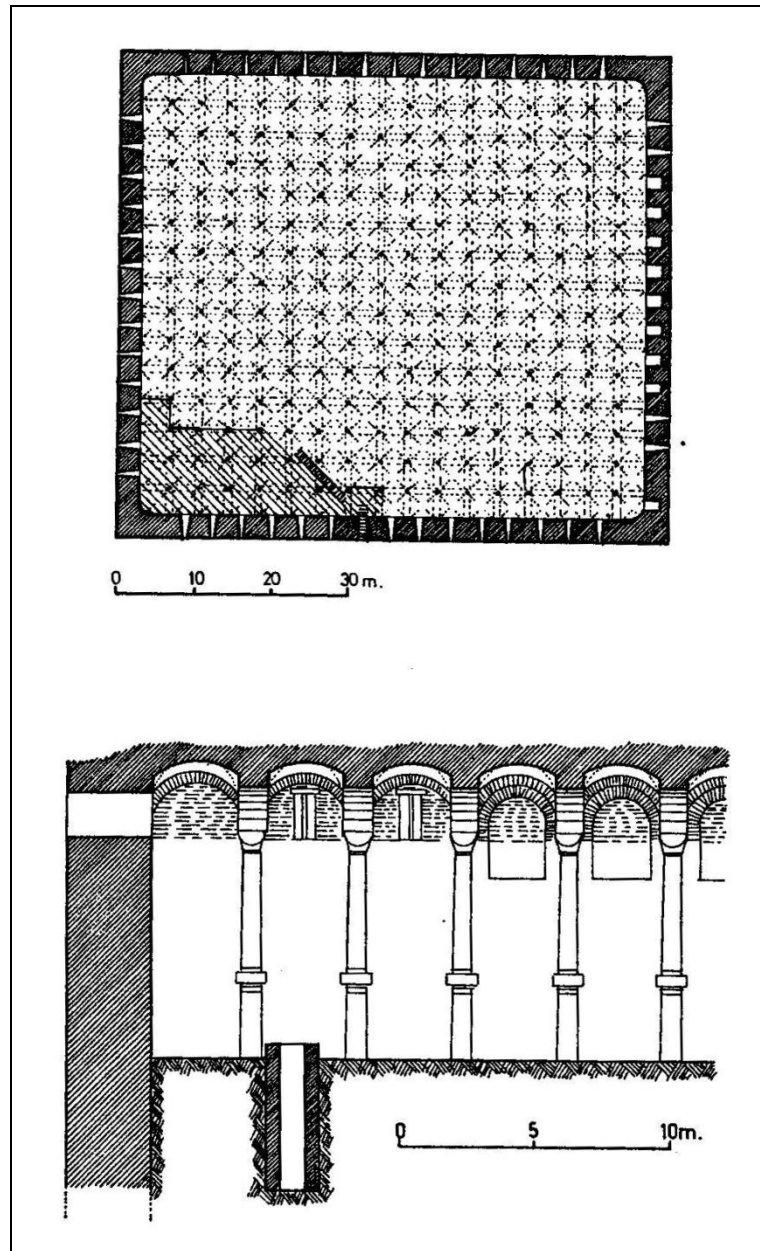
Basilica Cistern (Yerebatan Cistern); plan and section drawings
